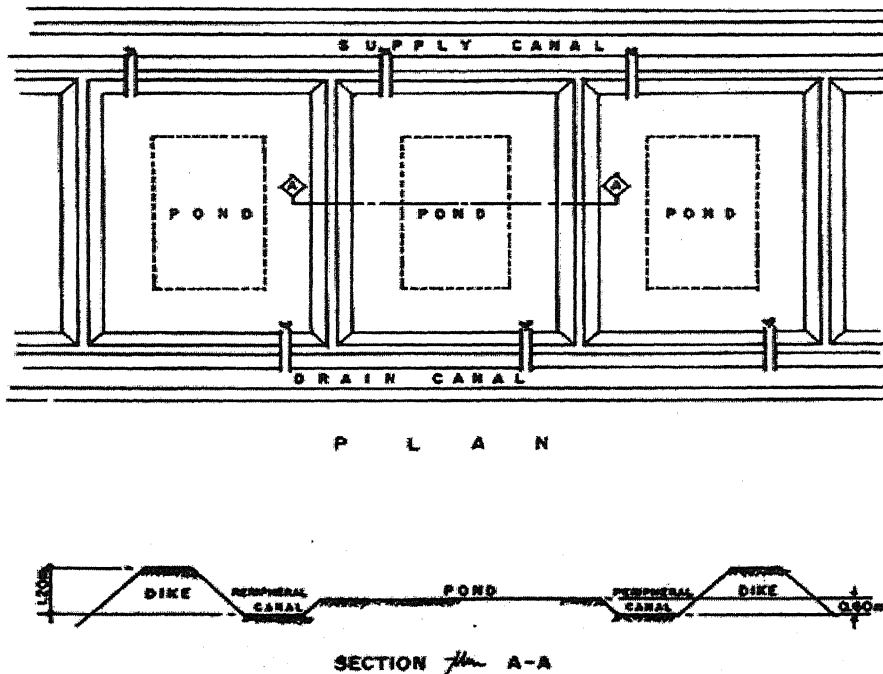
Earthen pond layout with peripheral canal (Plan and section)
